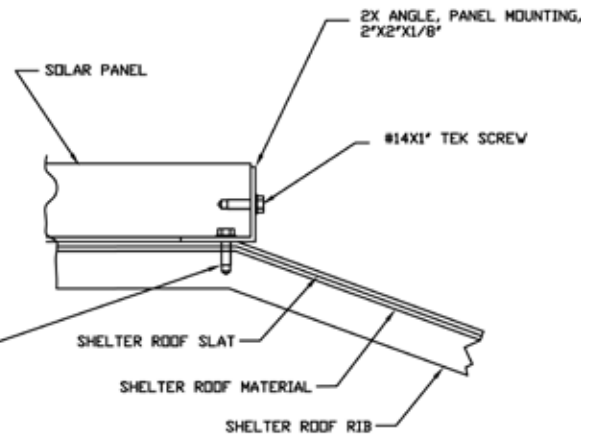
MOUNTING DETAIL FOR DOME ROOF
